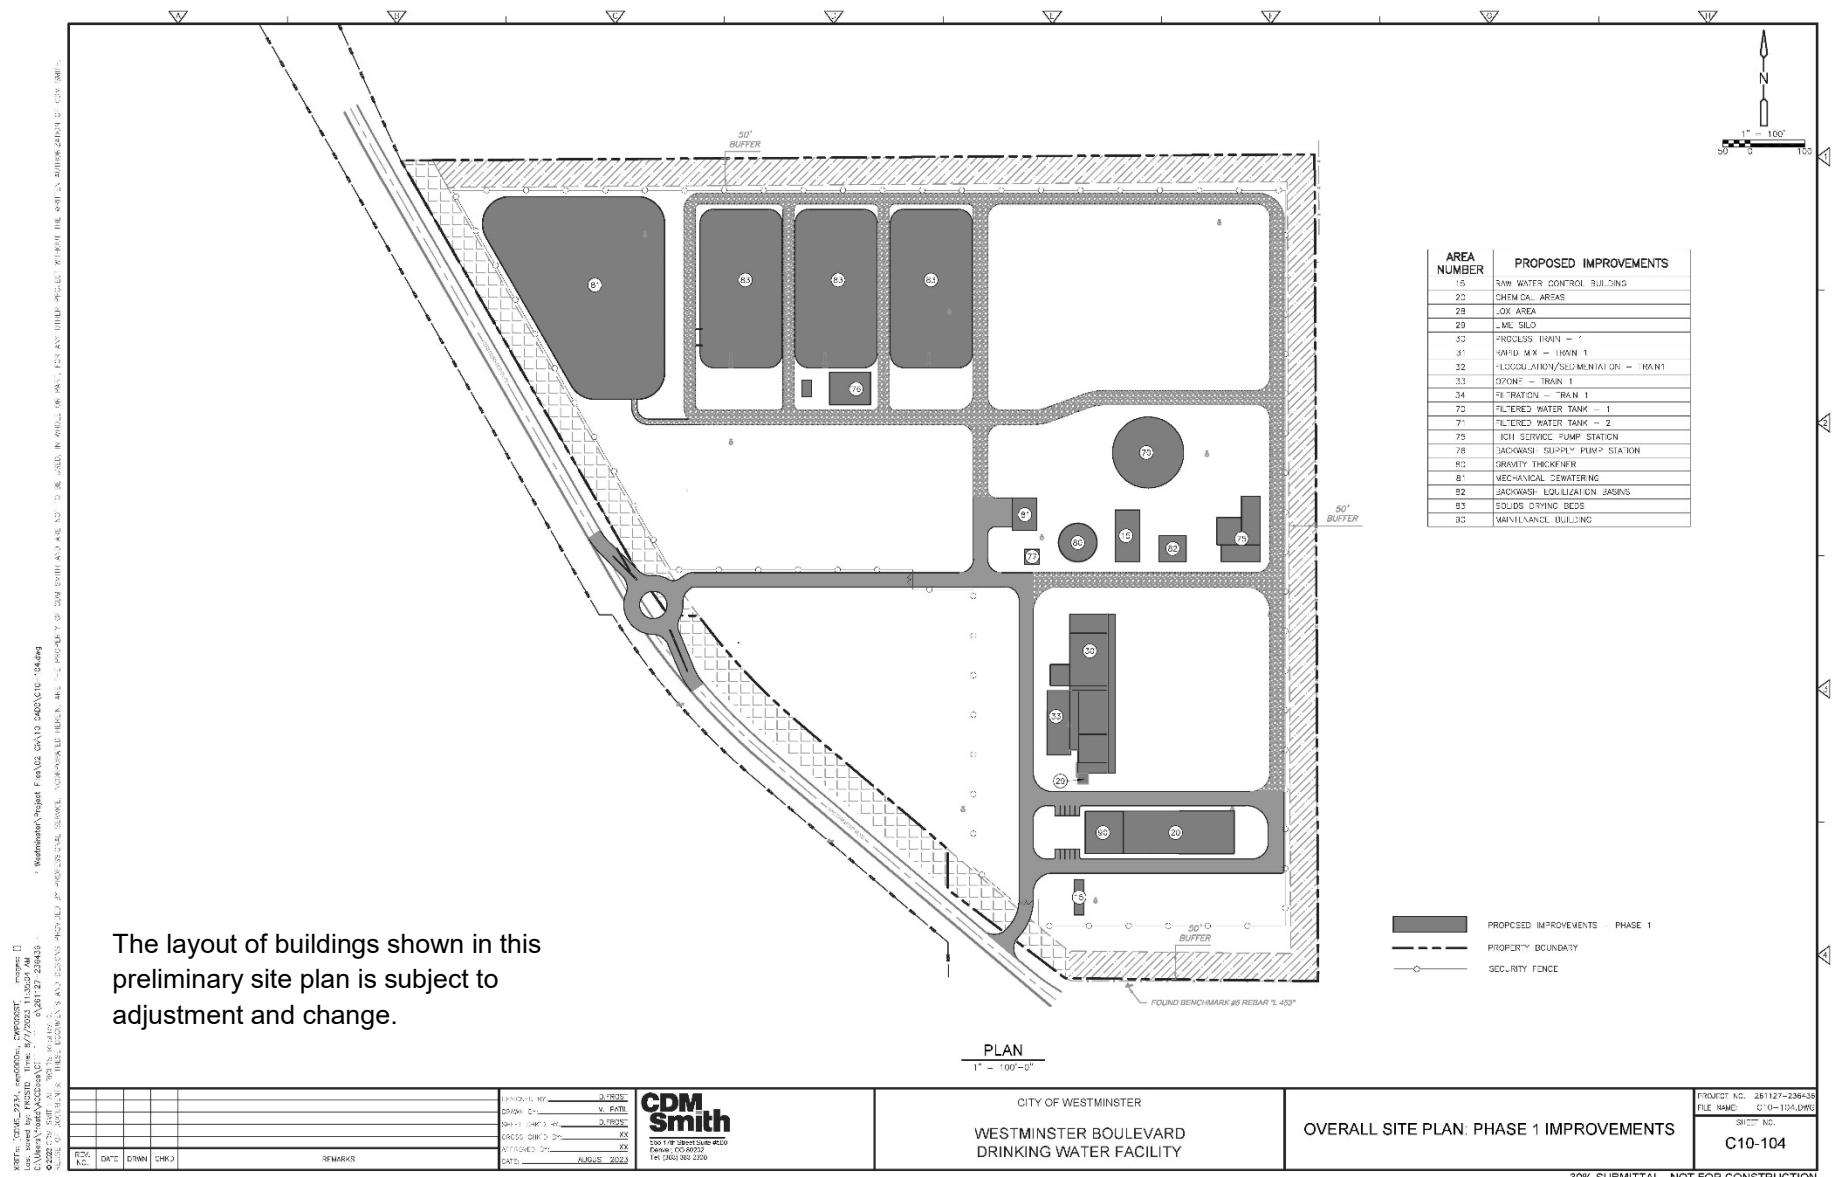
Drinking Water Facility Preliminary Site Plan.
